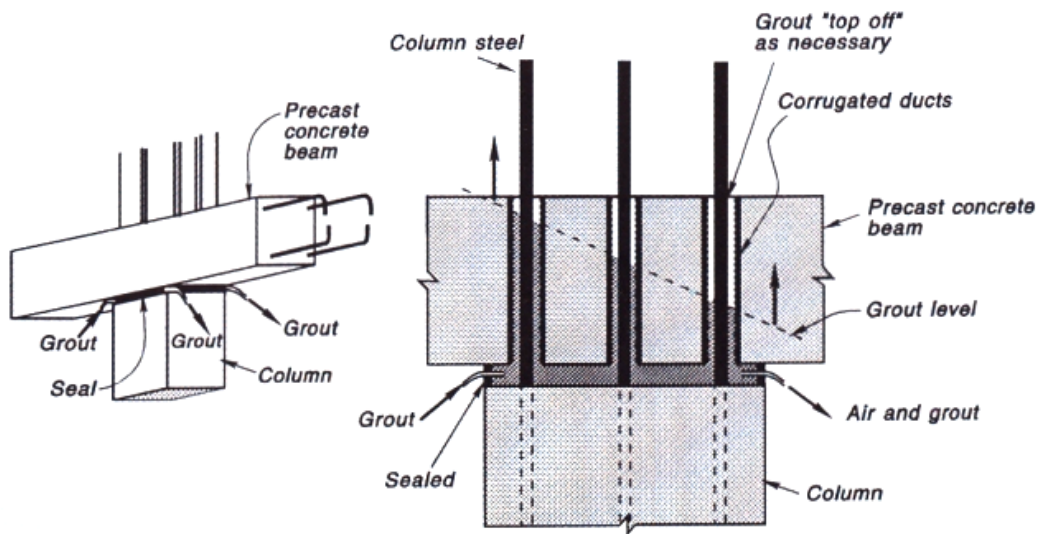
Precast Beam-Column Connections Used in New Zealand [1.8]
